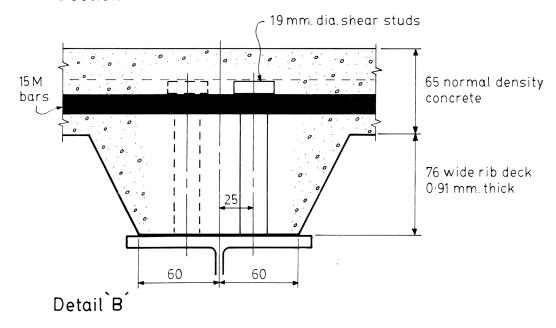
Composite Girder Test Specimen (Tested at McMaster University)
